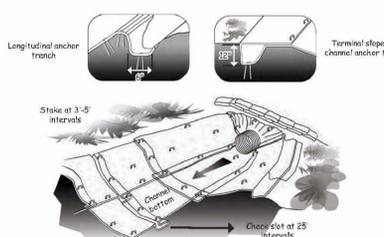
Channel Installation and Slope Installation, Washington State Ecology Department
